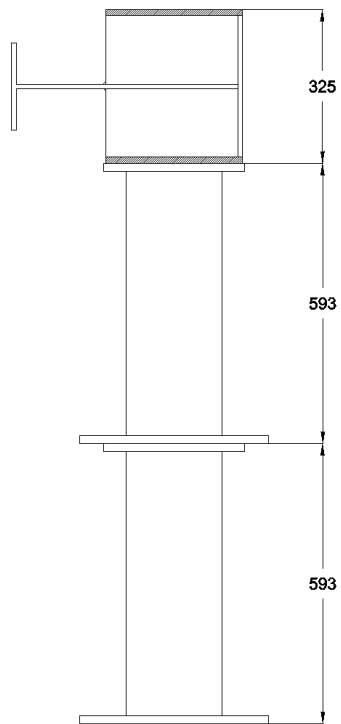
Test setup for type B specimens (all dimensions in mm).
